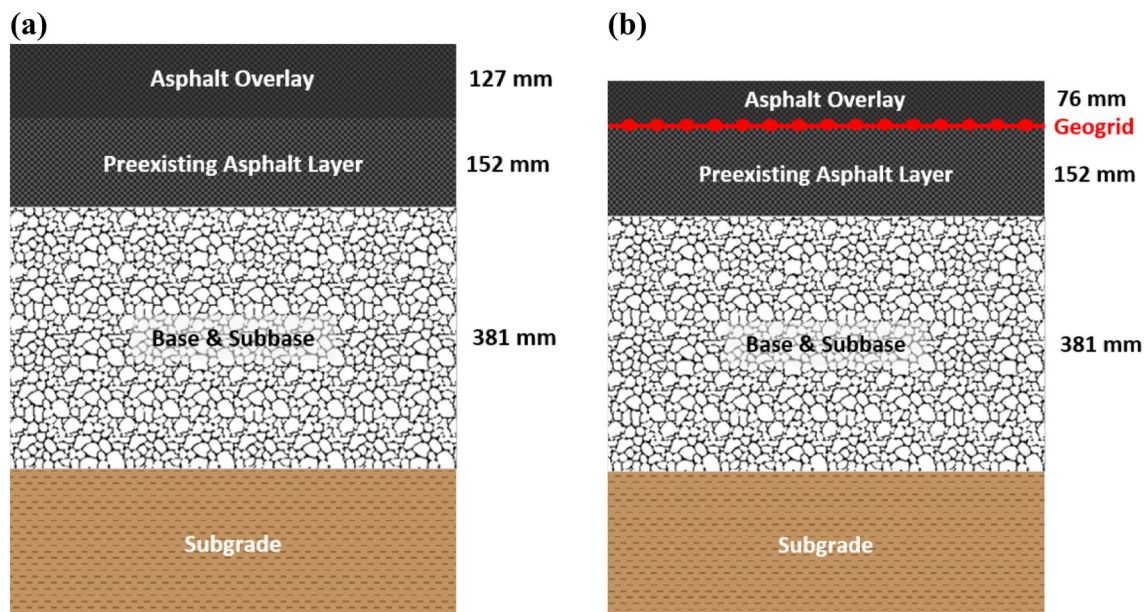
Cross-section of the case study involving asphalt reinforcement: a Section with conventional asphalt overlay; b Section with a geogrid-reinforced asphalt overlay
